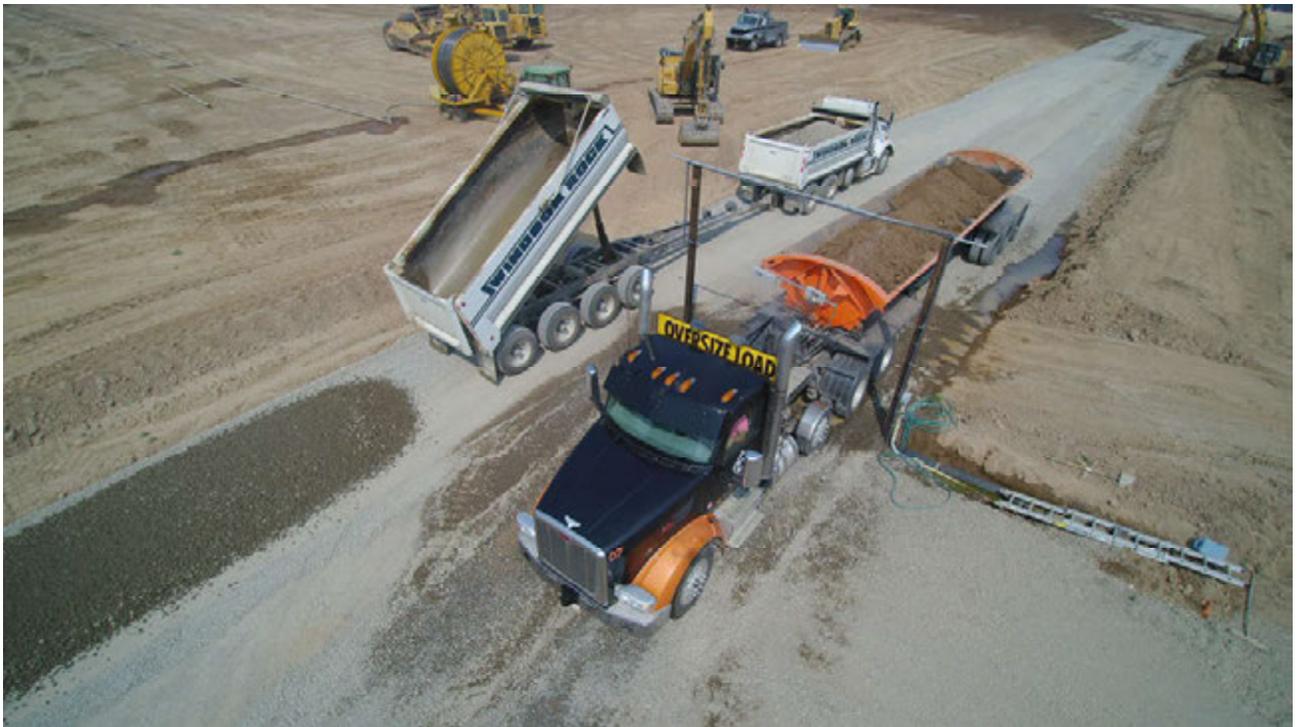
Side-dump truck running through wash bar and rock truck paving gravel on the temporary road (August 22, 2018).
